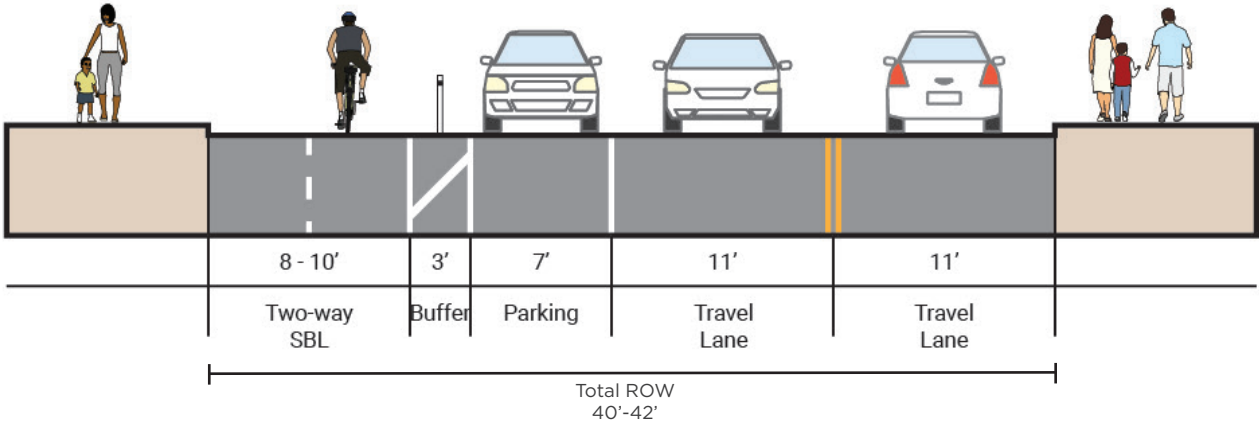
Lake Road Proposed Section (looking northbound)
